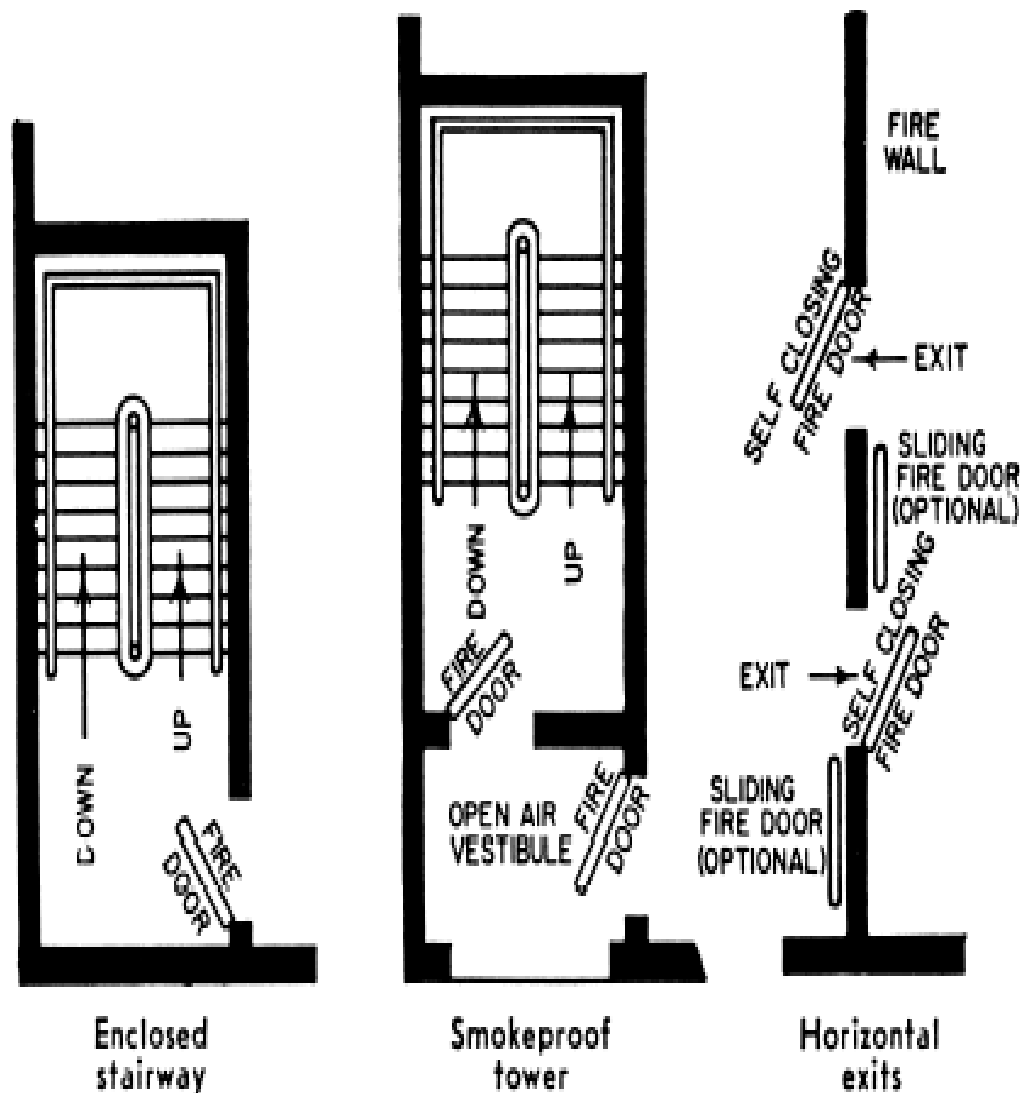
Plan views of types of exits. Stair enclosure prevents fire on any floor from trapping persons above. A smokeproof tower is better because an opening to the air at each floor largely prevents the chance of smoke on the stairway. A smokeproof tower charged with positive air pressure is more likely to prevent smoke from entering. A horizontal exit provides a quick refuge and decreases the need for a hasty flight down stairs. Horizontal sliding fire doors provided for safeguarding property values are arranged to close automatically in case of fire. Swinging doors are self-closing. Two wall openings are needed for exit in two directions. (Reprinted with permission from the National Fire Protection Association.)
